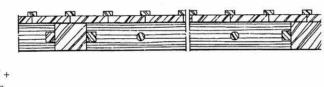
Exterior wall structure developed for the Puu-Käpylä area in Helsinki. Horizontal section 1/20.
